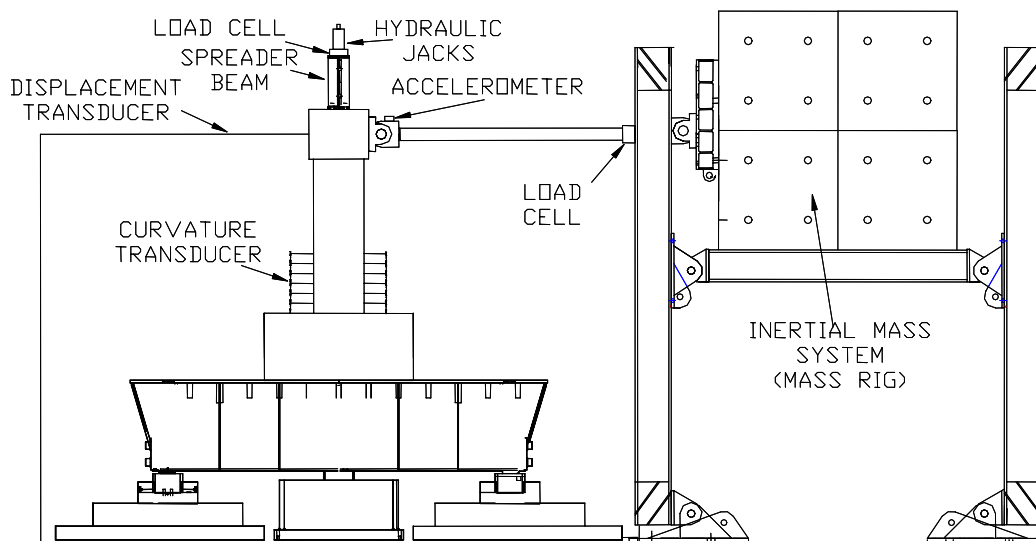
Schematic of the Test Setup for Specimens with Low Shear
